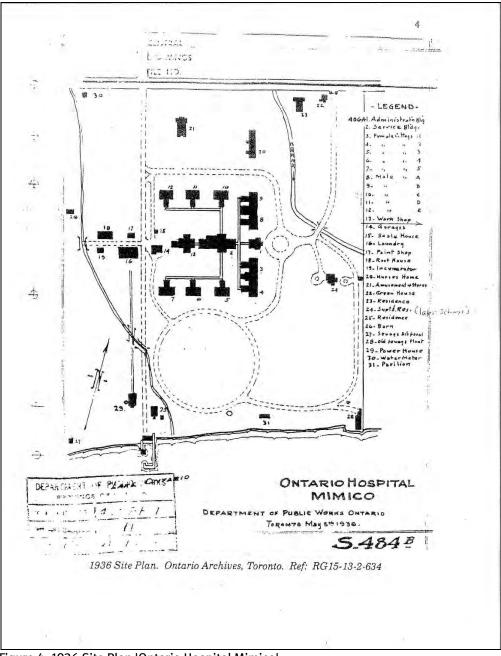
1936 Site Plan 'Ontario Hospital Mimico'
